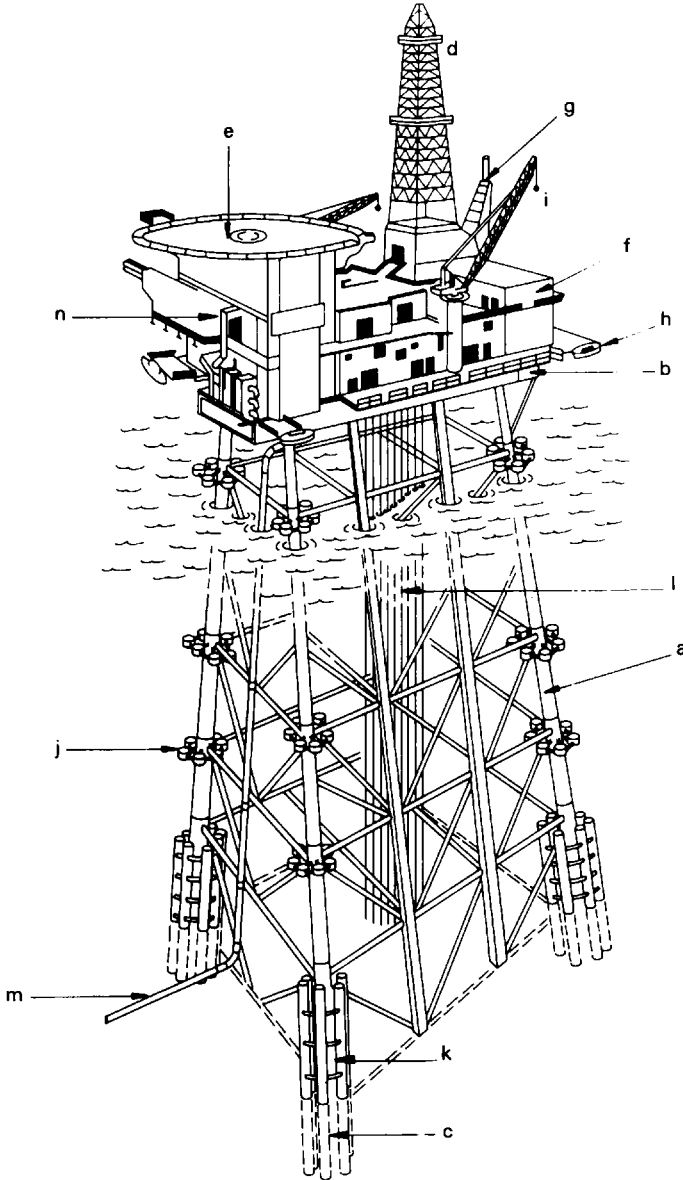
Typical offshore drilling and production platform. Key: a – jacket; b – module support frame; c – piles; d – drilling derrick; e – helicopter pad; f – drilling and production equipment; g – flare stack; h – survival craft; i – revolving cranes; j – pile guides; k – pile sleeves; l – drilling and production risers; m – export pipes; n – accommodation
